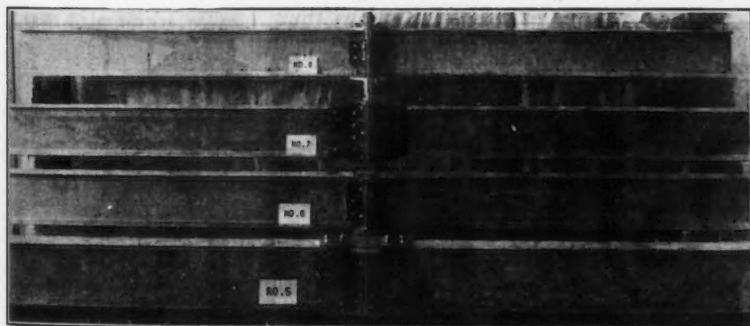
SPECIMENS 5, 6, 7, AND 8.
